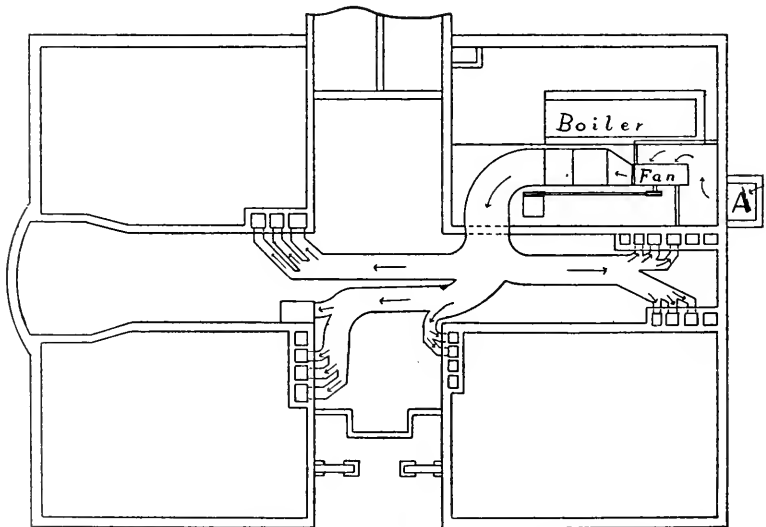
PLAN SHOWING ARRANGEMENT OF HEATING APPARATUS.
